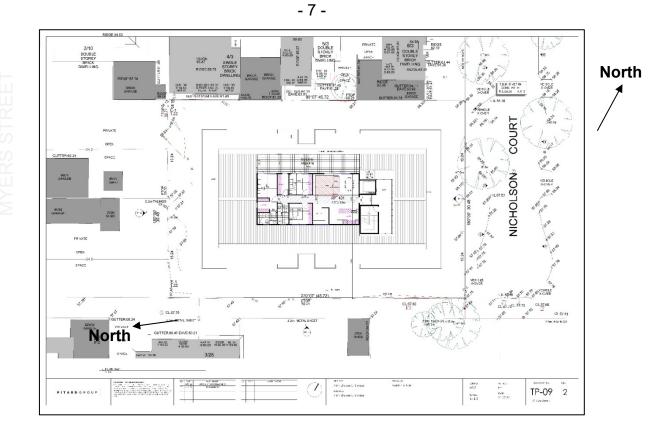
Level 4 floor plan of the proposed 7-9 Nicholson Court Development
